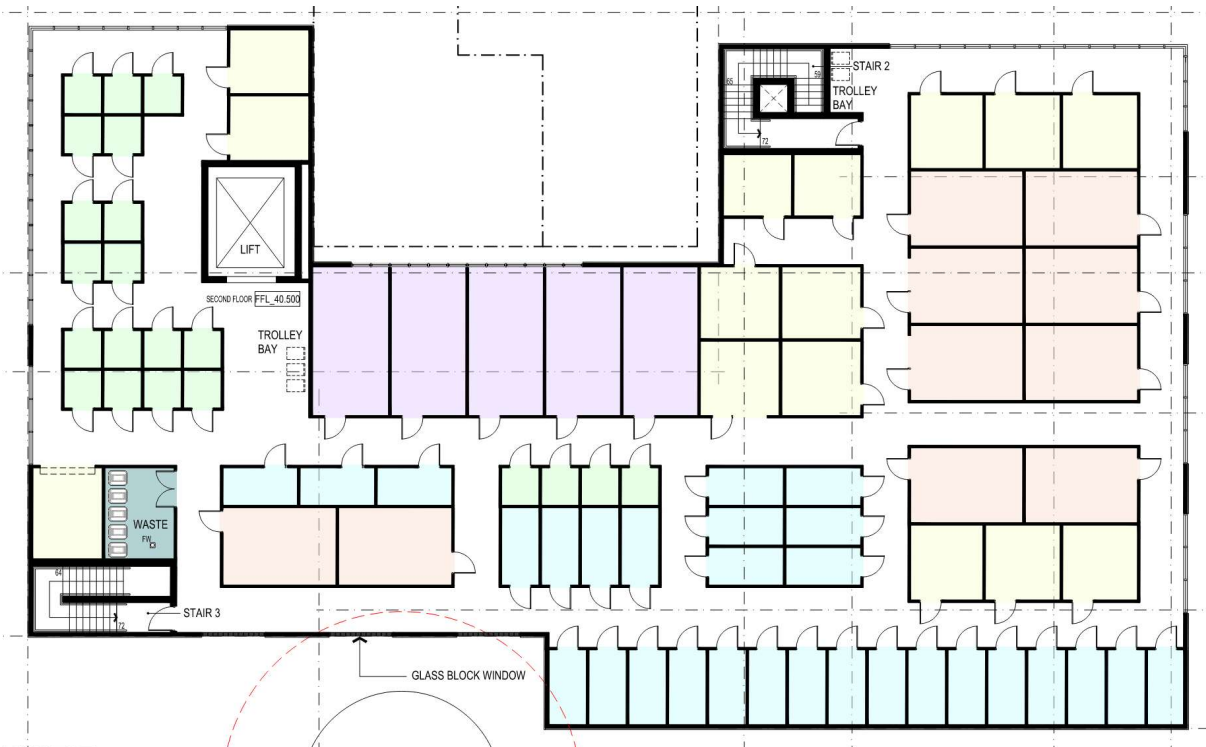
Crawford Architects Drawing A103 –Second Floor Level
